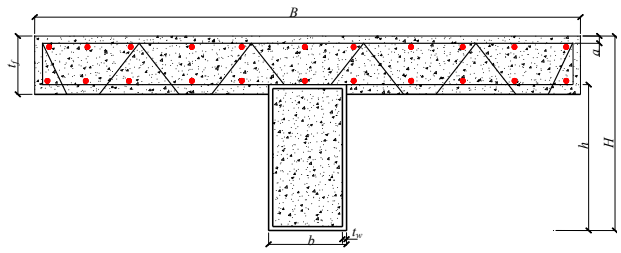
Schematic of sectional dimensions of assembled U-shaped steel–concrete composite beams
